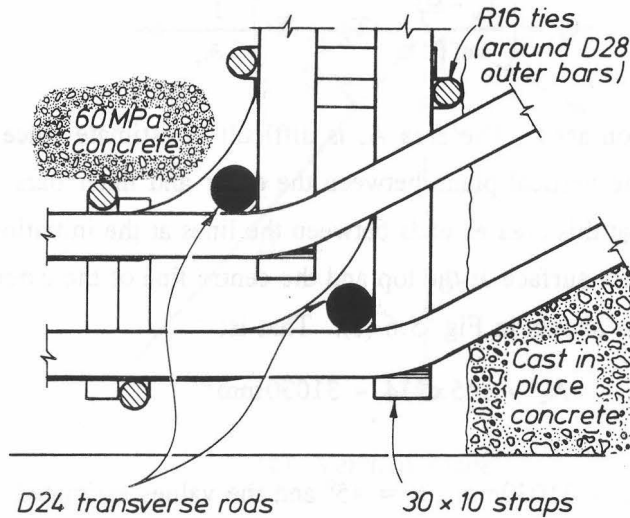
Reinforcement Detail at the Bend of the Diagonal Reinforcement in Unit 4r.
